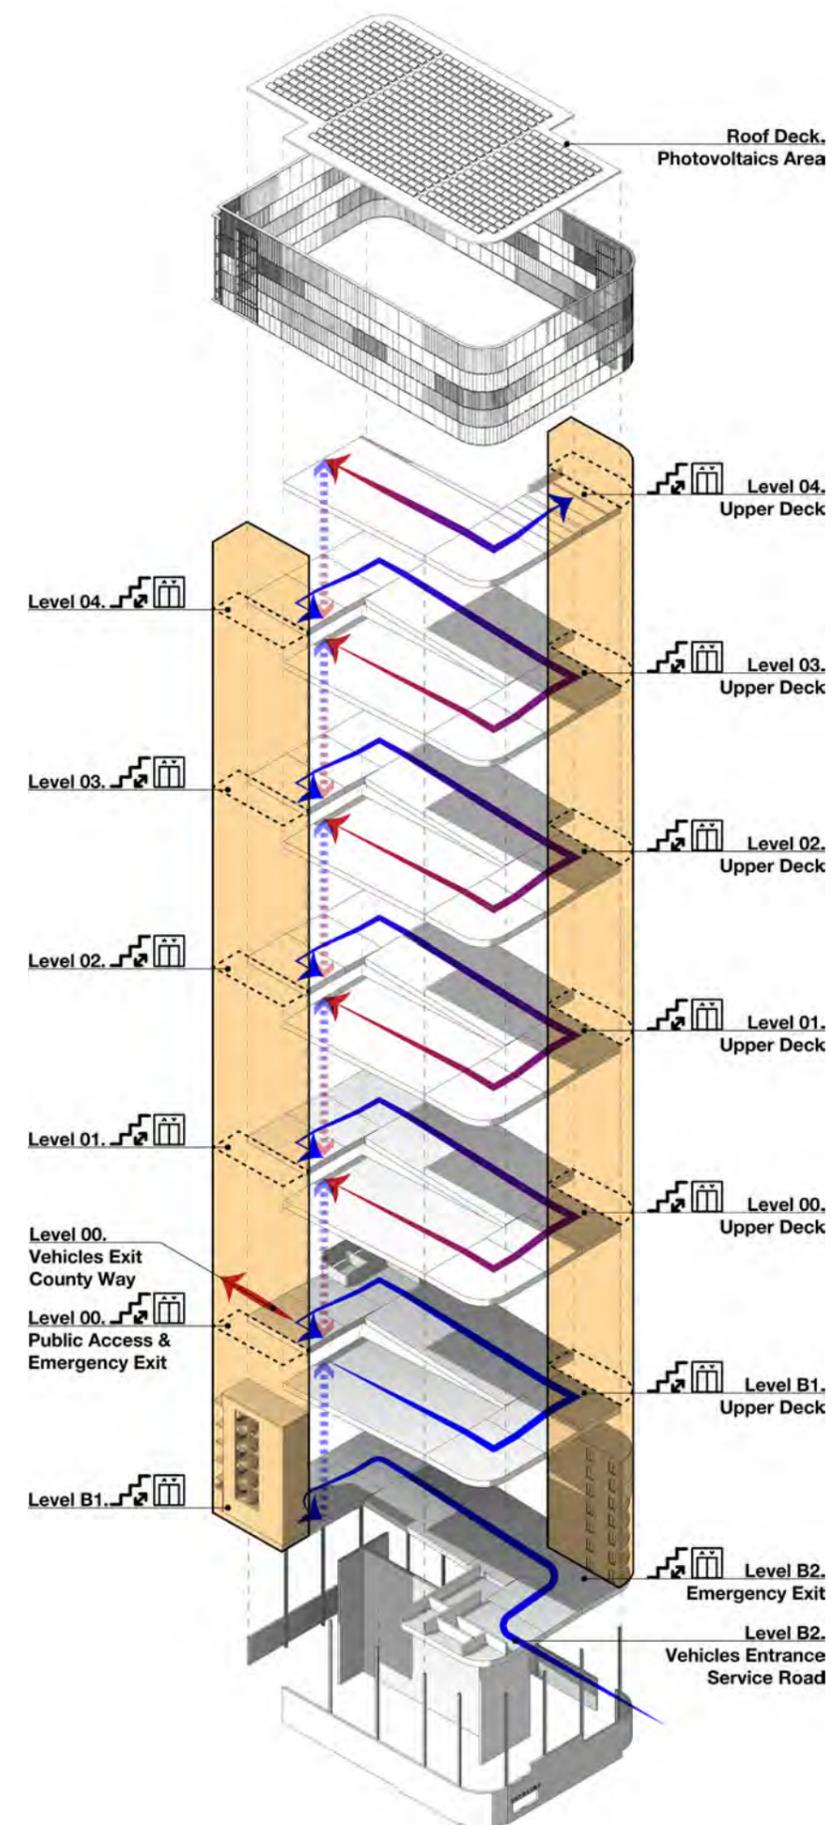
Proposed design - exploded axonometric view of internal circulation.
